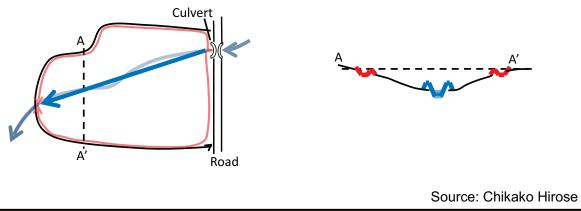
Concept of Design the boundary of ridges and construction of canal
